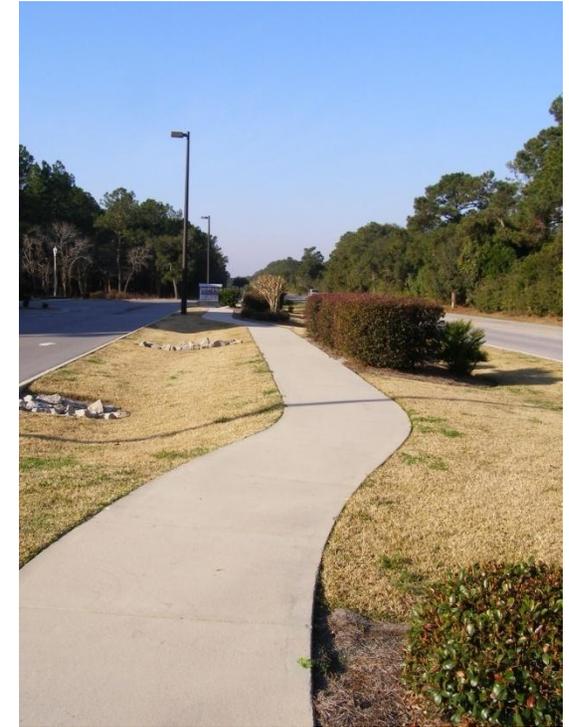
Existing 5' sidewalk running adjacent to the southern edge of Sunset Boulevard North. (Image Source: HCP).
